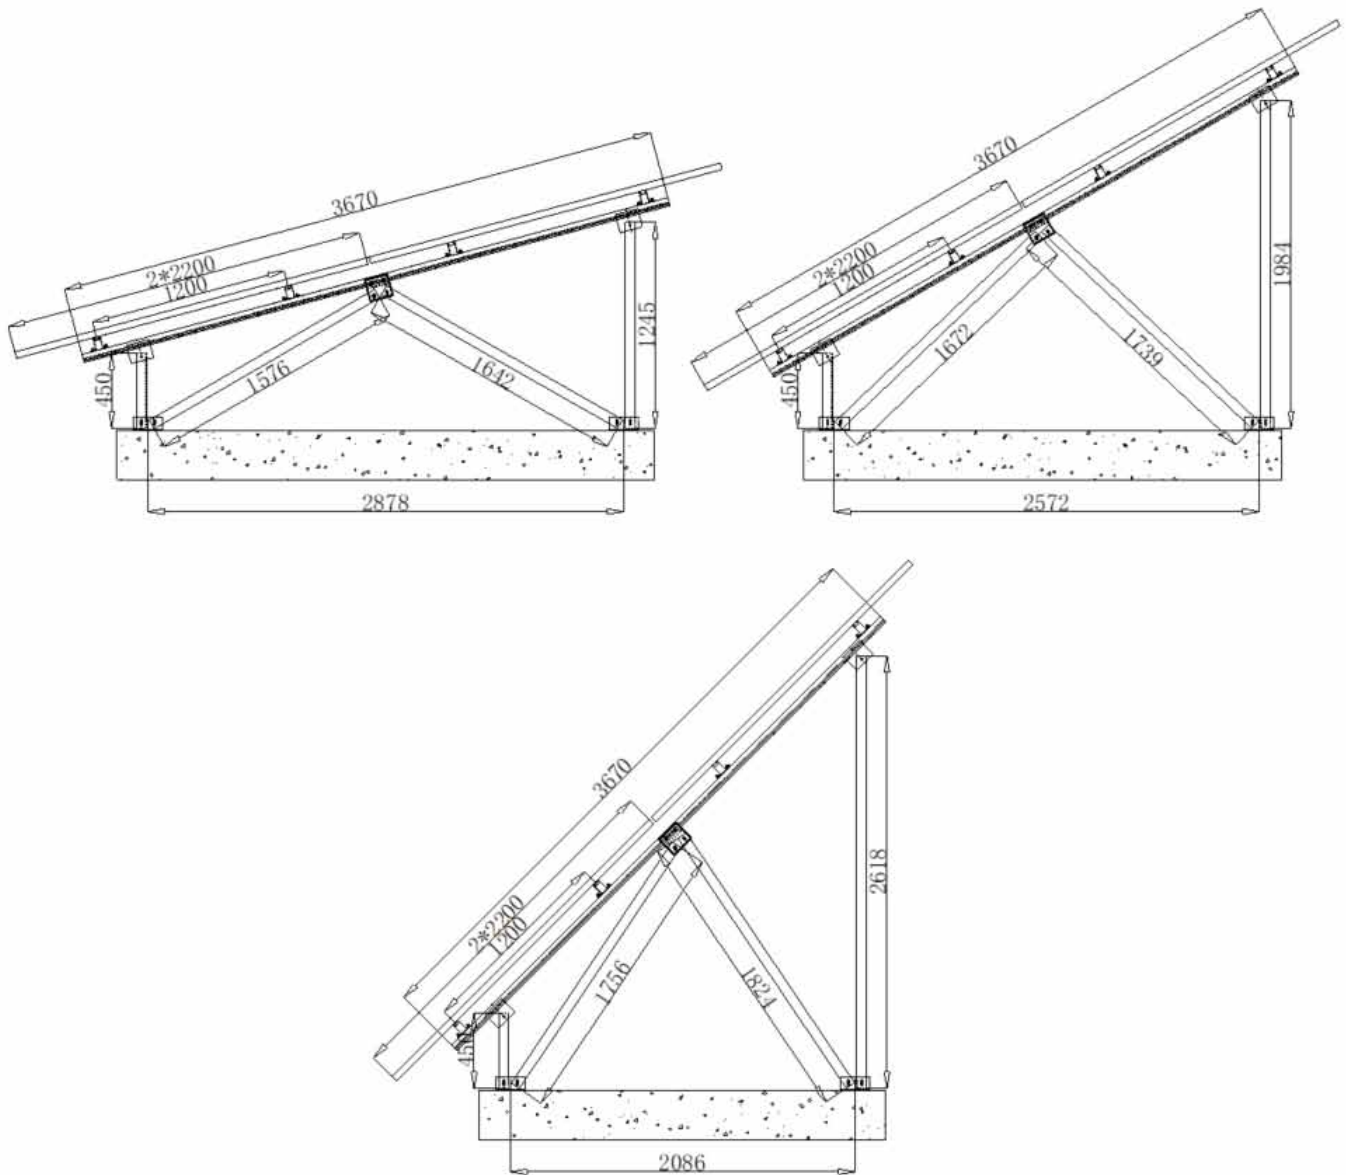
PV Panel 2200x1200mm with Concrete Footing Details
